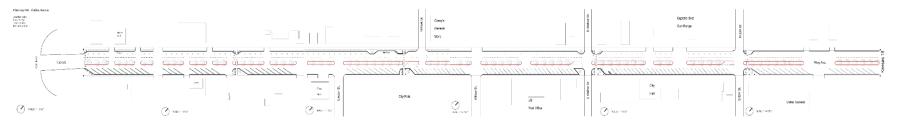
e: Recommendations from K-State student group plan titled "Future Streetscape Visioning for Riley Avenue
